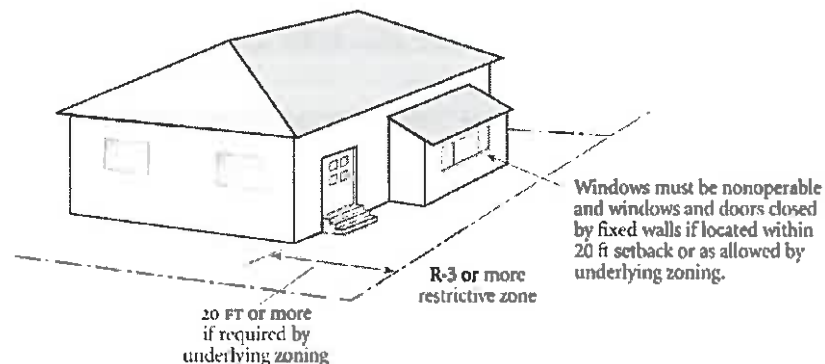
B Building Setback for Child Care in Residential and Office Zones
